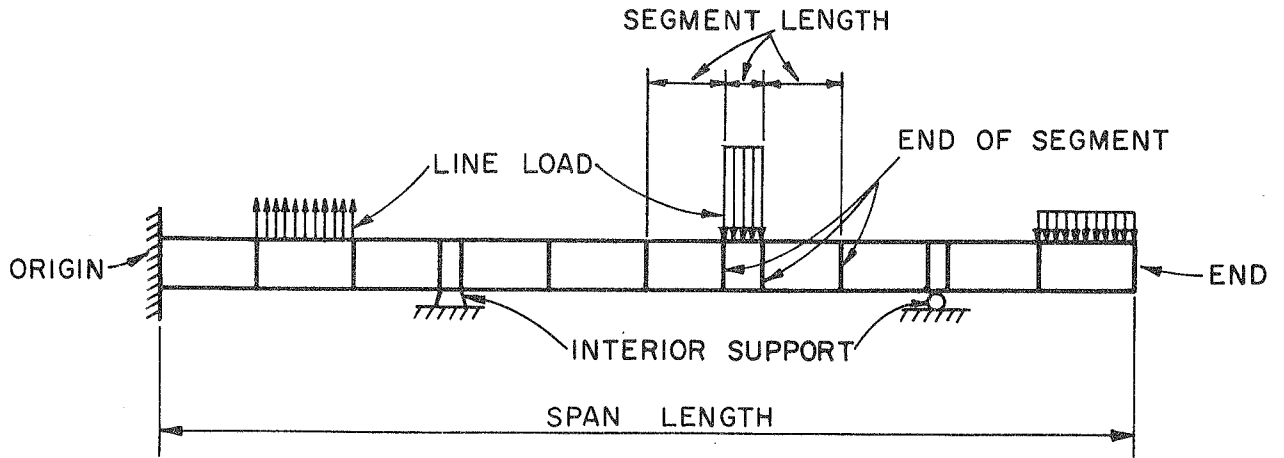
LONGITUDINAL ELEVATION AND LOADING
